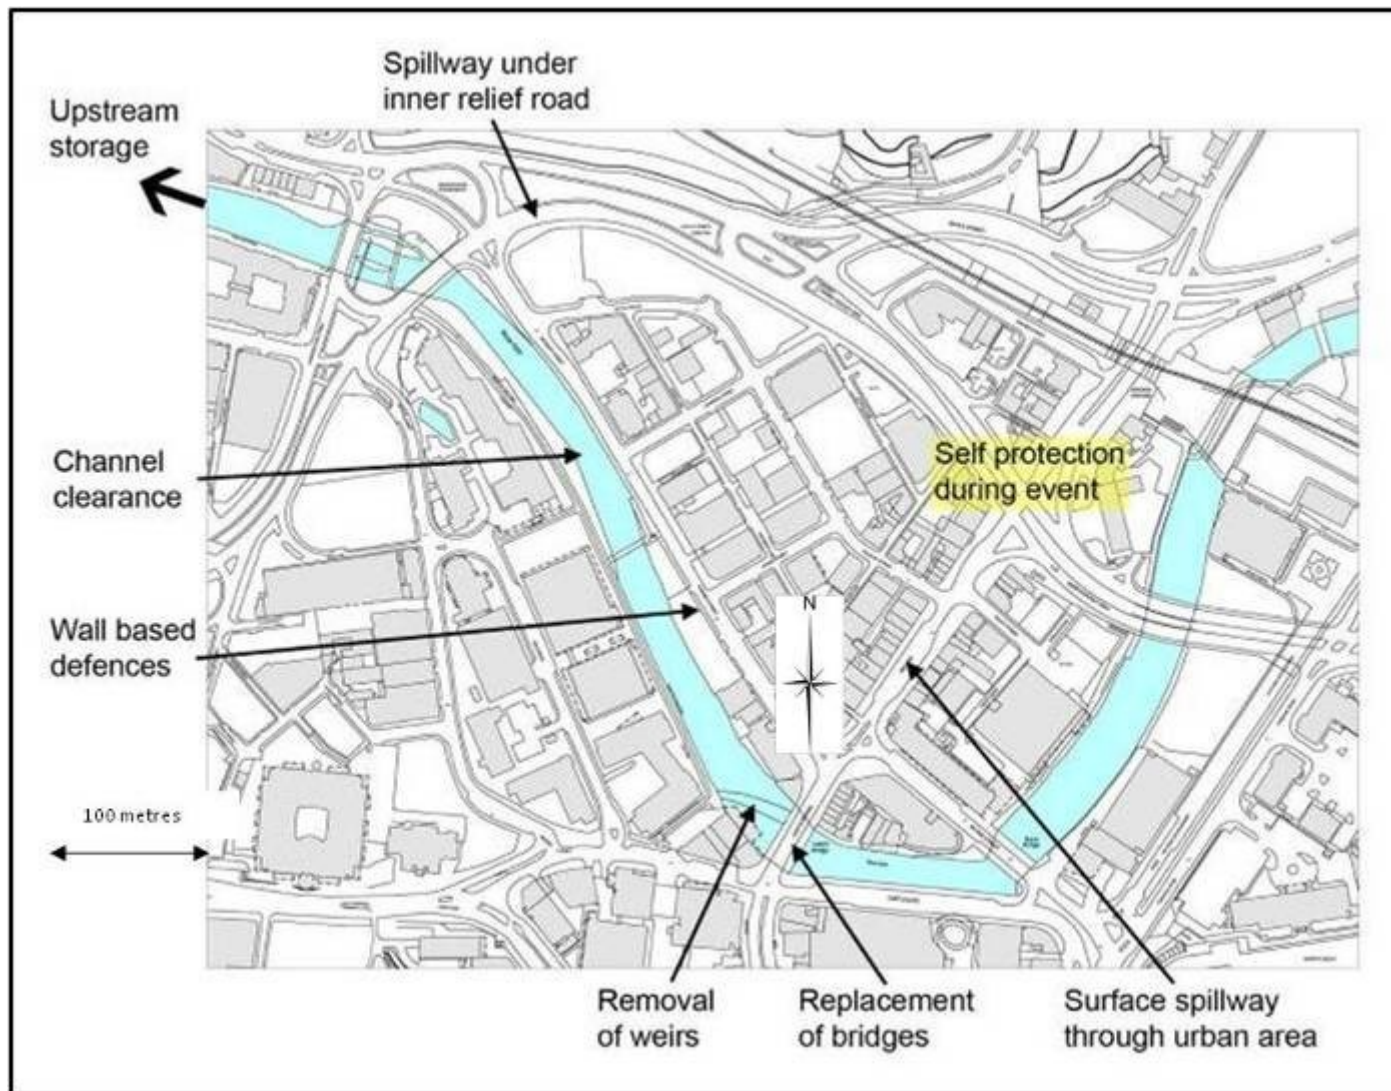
Plan showing Wicker area, ring road and options for alleviation
